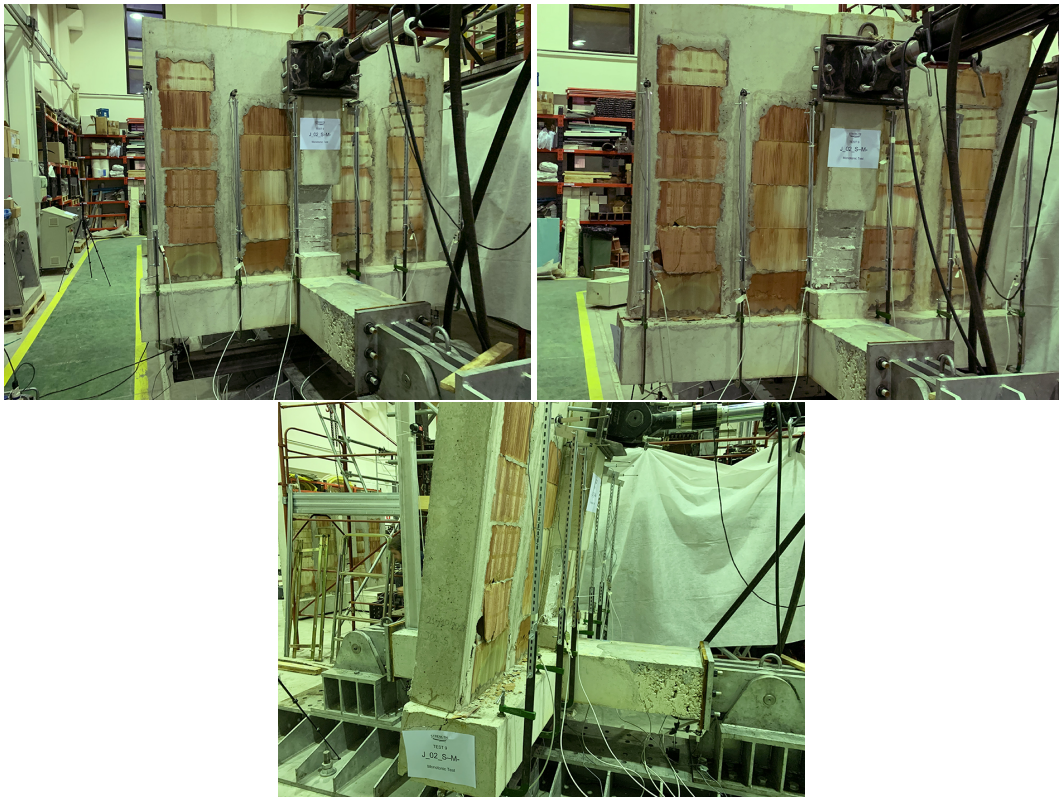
Crack pattern evolution on the joists side of $J_{02_S} - M^-$ specimen.
